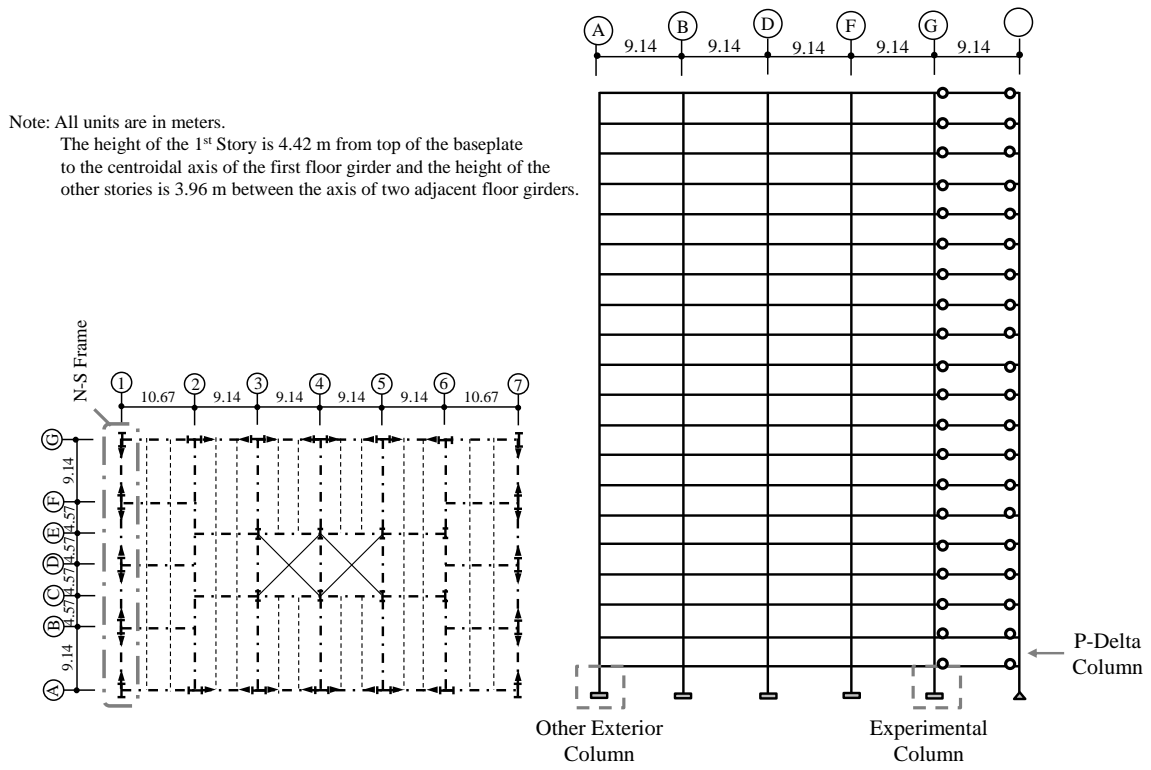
Typical floor plan of the 20-story building (left) and elevation view of prototype model of N-S frame (right)
